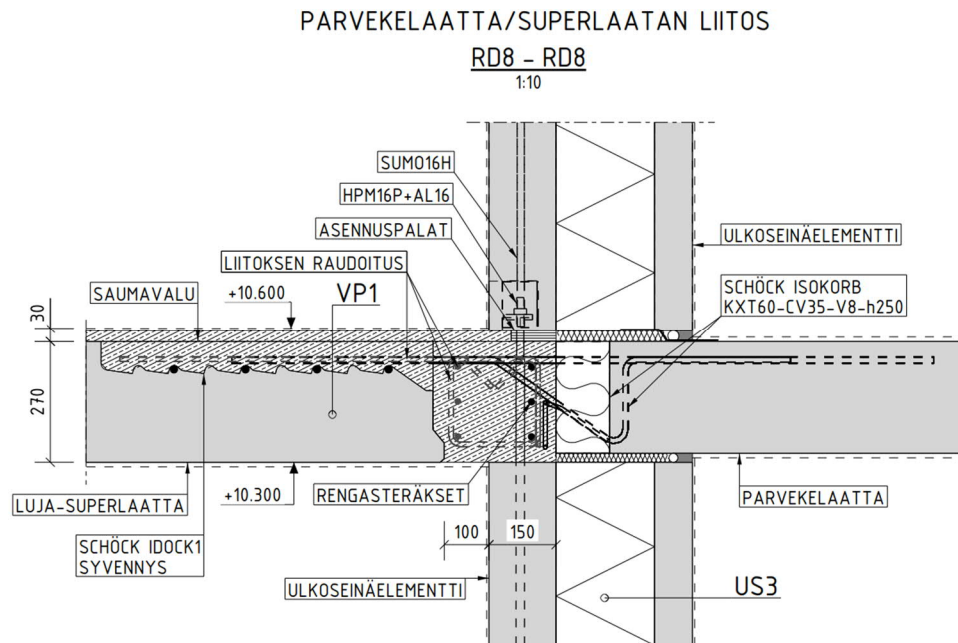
Balcony slab connection with integrated Schöck IDock (Tekla Structures drawing snapshot)
